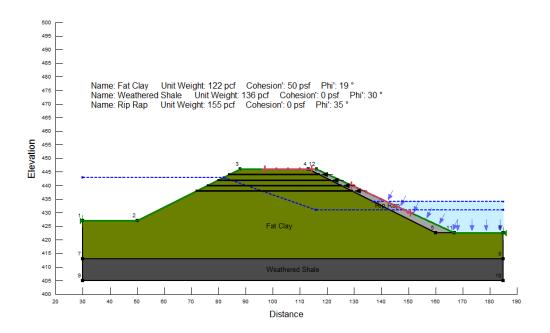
ALTERNATIVE 2 - 2H:1V REINFORCED SLOPE - WITH RIPRAP
